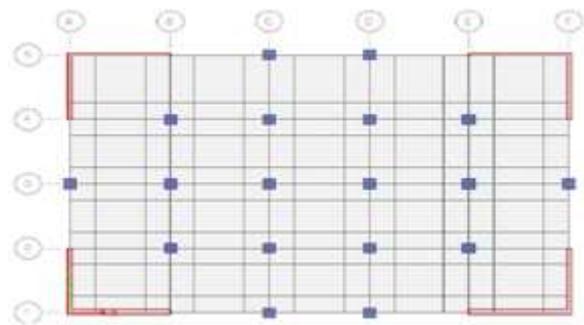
PLAN- FLAT SLAB WITH L- SHAPED SHEAR WALL
